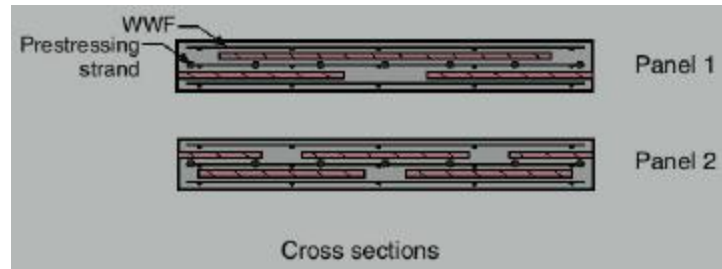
Cross sectional view of the two panels tested by Lee and Pessiki (2008)
